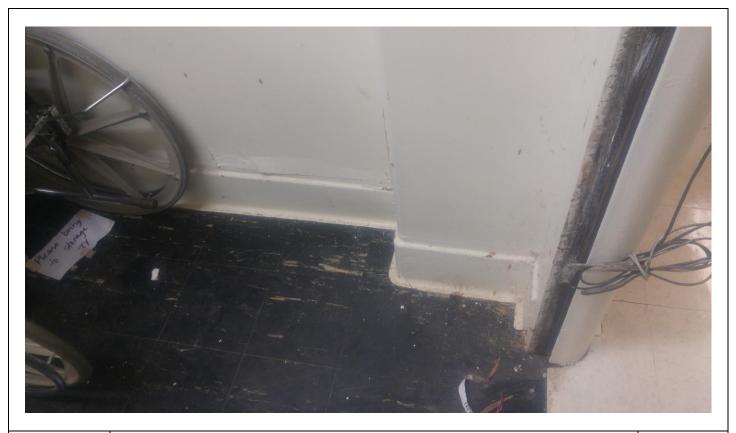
April 26, 2018 Project Site: Young Building - First Floor – Leahi Hospital, Honolulu, Hawaii Description: Asbestos-containing 9-inch by 9-inch floor tiles and associated mastic Client: CKM Architects, LLC.
